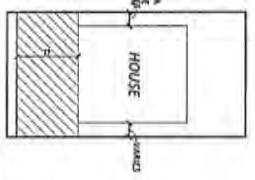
PHOTO CONSERVATION ZONE AREA, N.T.S.
